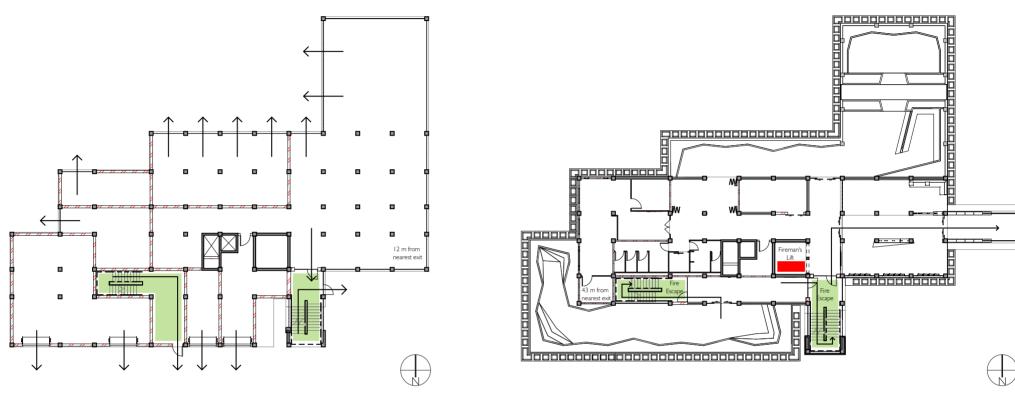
Lower Ground floor plan - Fire (Not to scale, by Author)
